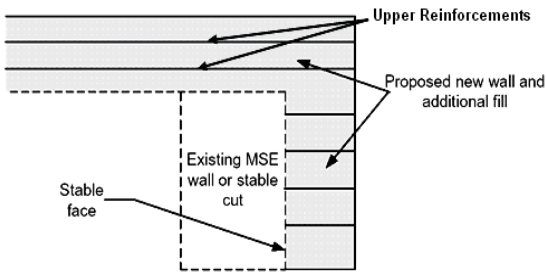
Extend the upper reinforcements over the top of an existing stable wall
